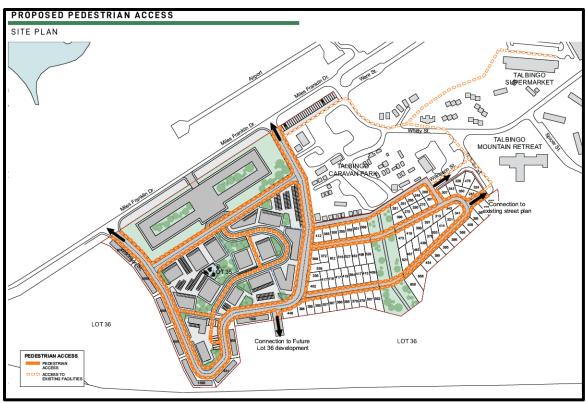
Pedestrian Access (Source: Robert Harwood Architects)
